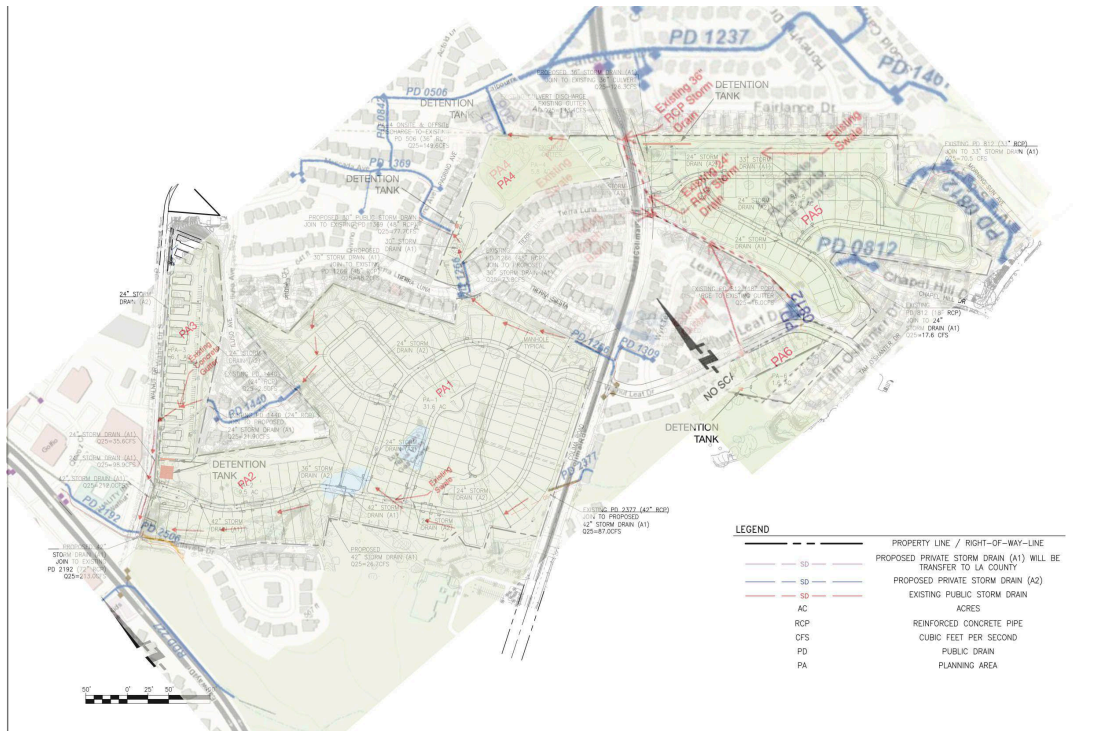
Overlay Of Existing And Proposed Drainage On The Project Site
